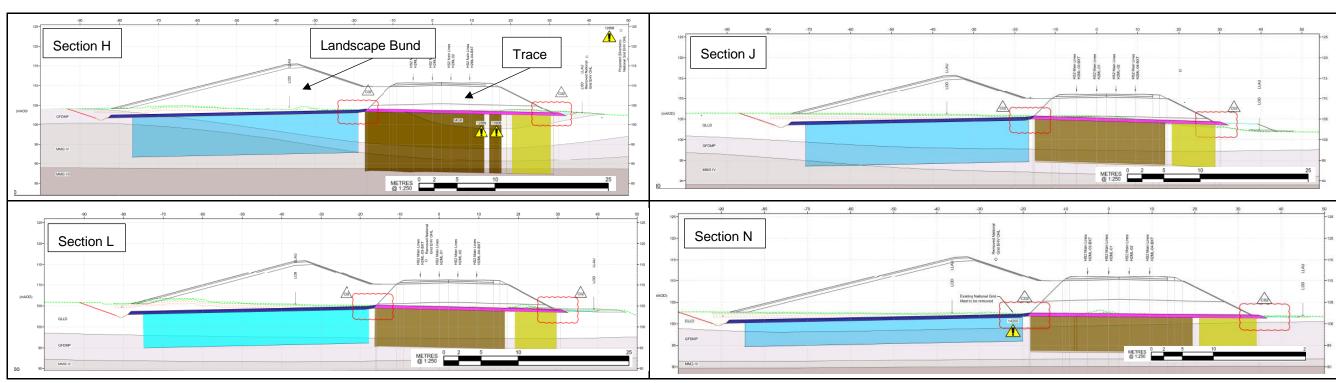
Location of cross sections used to calculate design base elevations for the placement of MBL sourced material at the site
